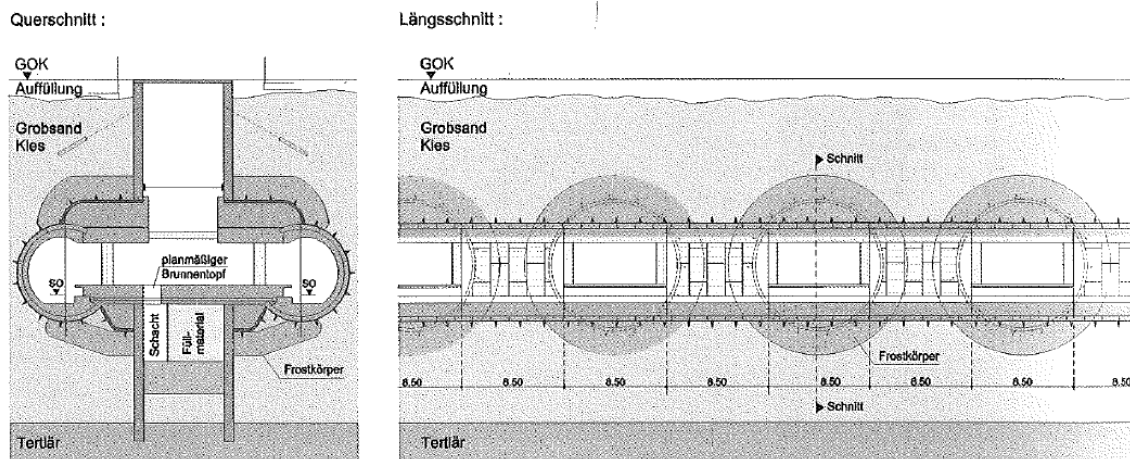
Cross and longitudinal section of the optional station design with one large platform for two tracks
